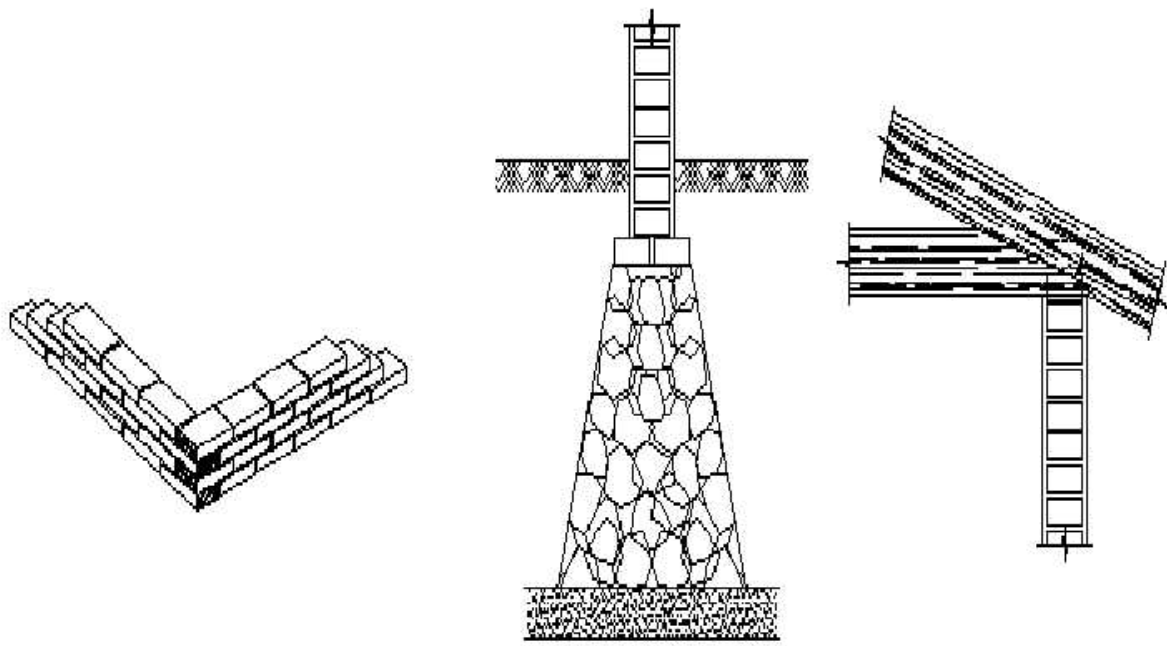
Critical Structural Details: wall section, foundations, and roof-wall connection
